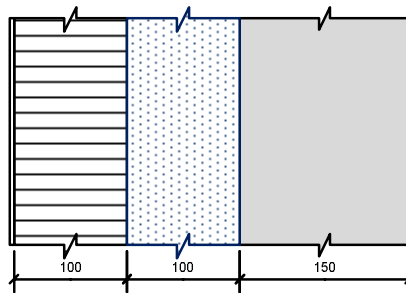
Refurbishing cavity wall by adding thermal insulation (EPS beads, mineral wool or PUR foam) in the cavity of a wall.
